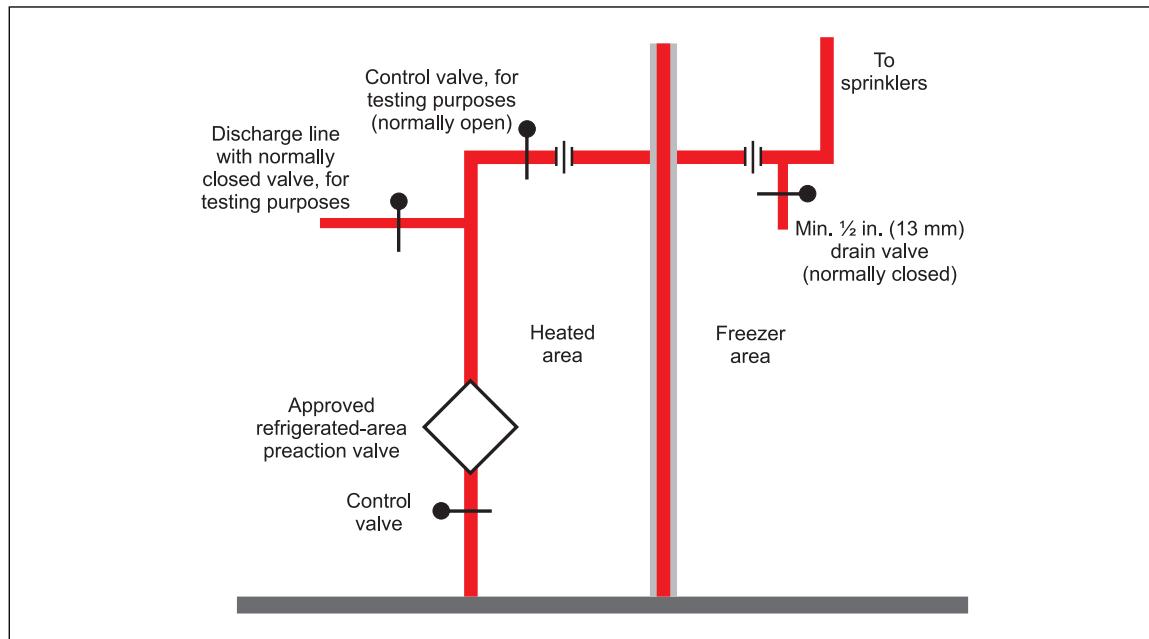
Example of a sprinkler riser arrangement for a refrigerated-area sprinkler system
